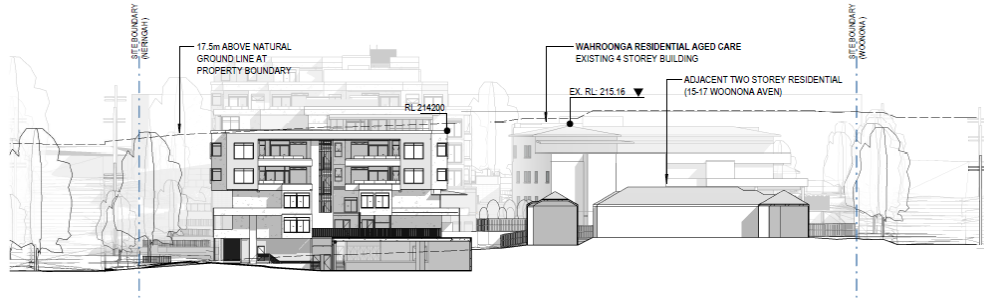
Proposed site elevation – North. (Source: Bickerton Masters Architects)
